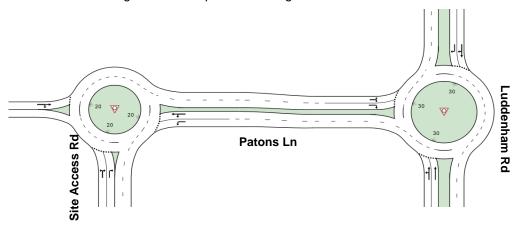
Assessed intersection layout (Stages 1-3)
